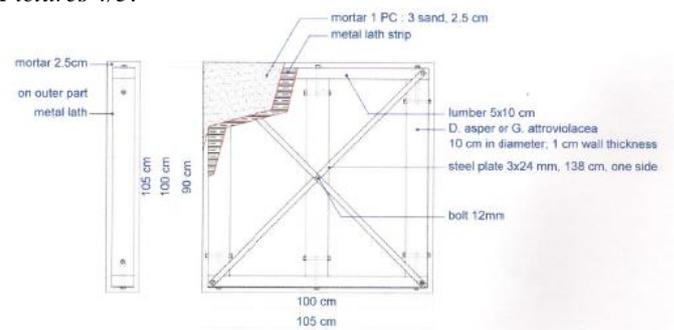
Specimen design for fire testing - Constructive Details for specimen with metallic plaster carrier
